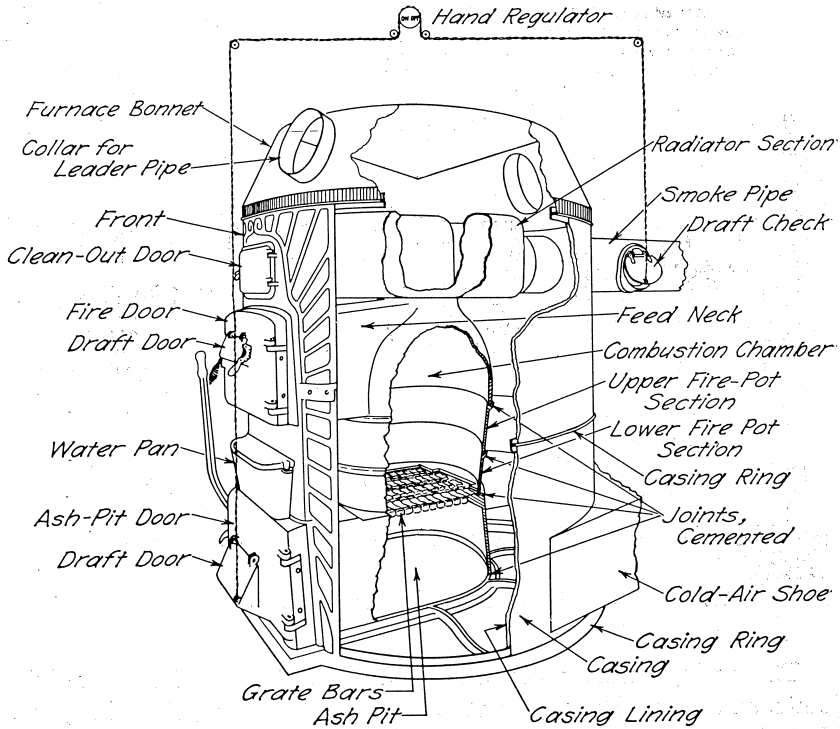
SECTIONAL ELEVATION OF CAST-IRON GRAVITY-FLOW WARM-AIR FURNACE
